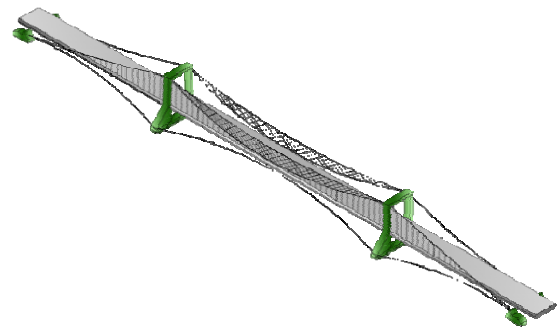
Prestressed suspension bridge with cable truss load carrying structure
